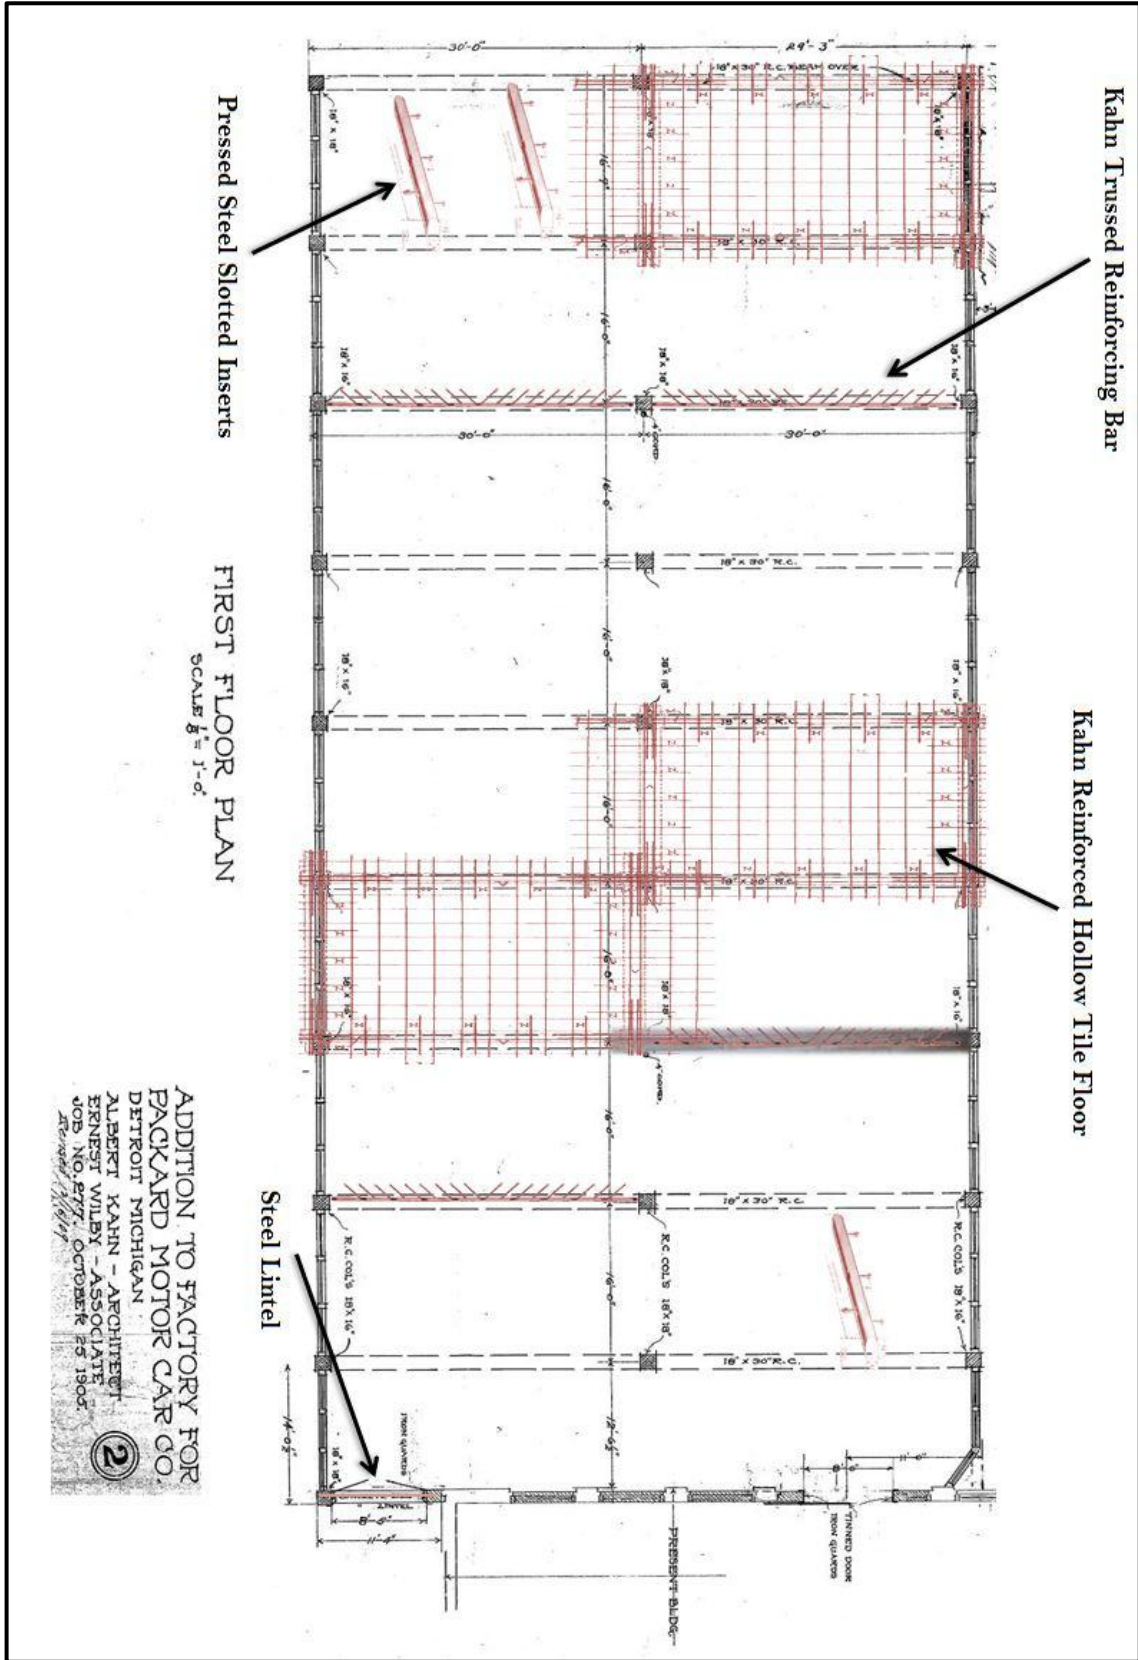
Trussed Concrete Steel Company Products Used in Packard #10, Plan View.
